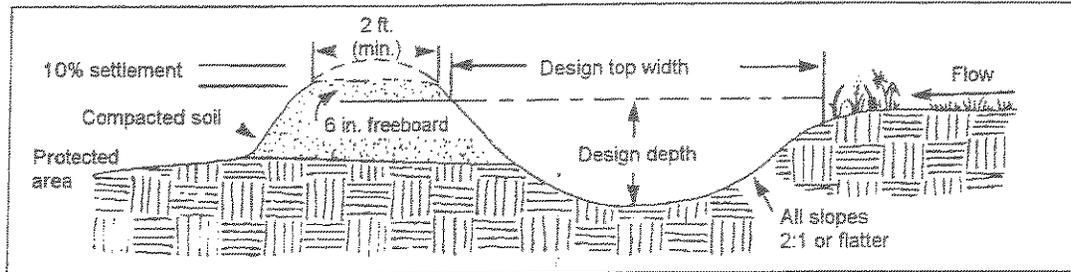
C. Cross-section view of a diversion or perimeter dike above an area to be protected.
